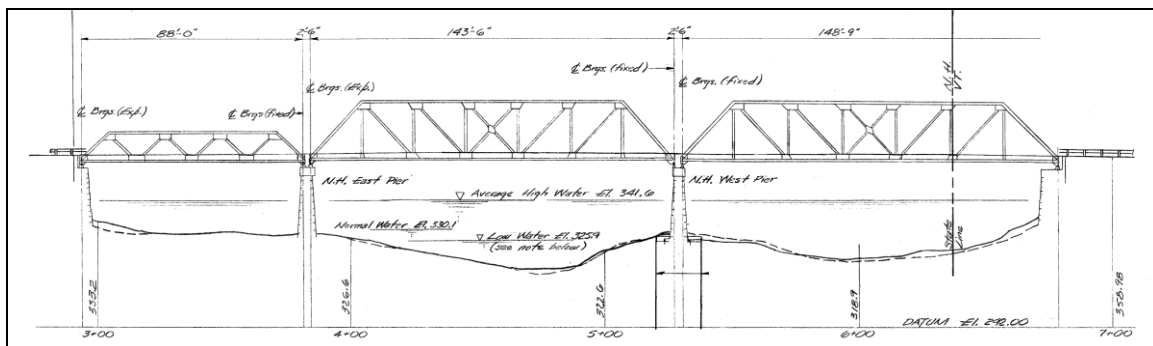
Lebanon -Hartford Bridge, elevation drawing from original bridge plans, showing two Pratt thru-truss spans and one Warren pony truss span (NHDOT 1935).
